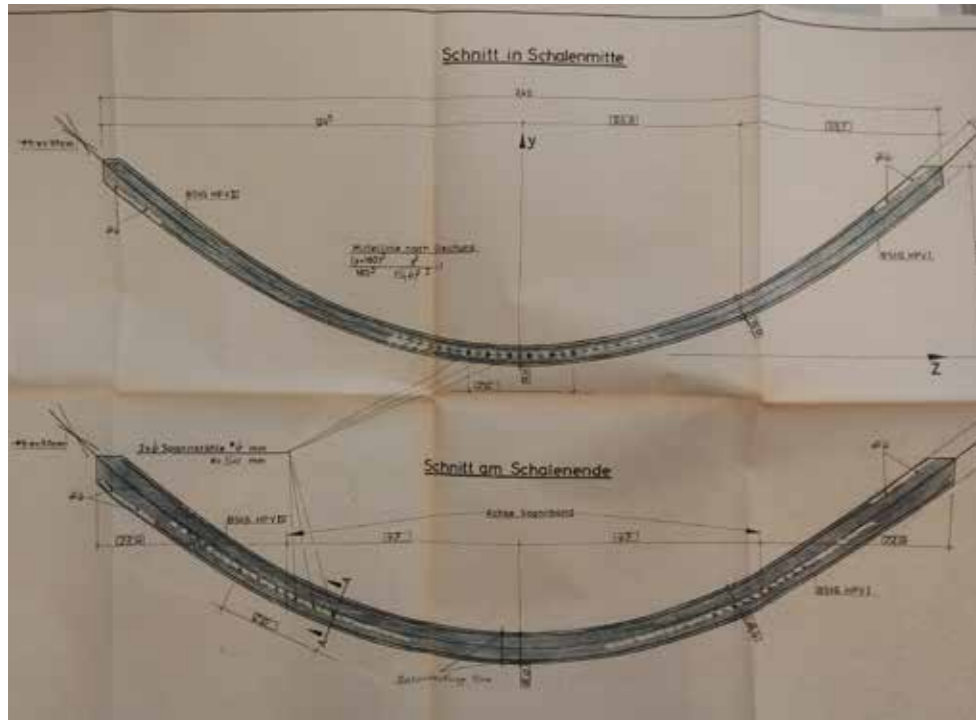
technical section of the shells used in building 436 archive Zaanstad
